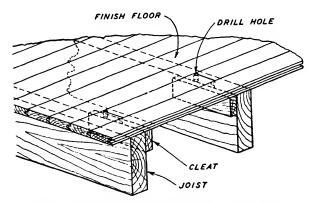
Floor Construction Showing Method of Supporting Floor Strip
